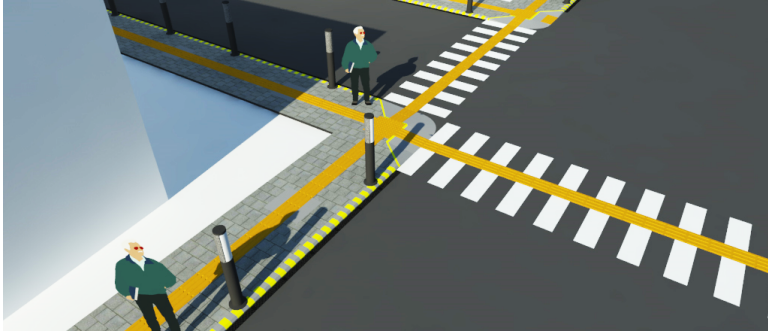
The Traffic crossings and intersections connecting PCU Main Campus and PCU East Campus. The curb ramps with 1:12 were provided. The additional guiding paths and speed bumps were added.
